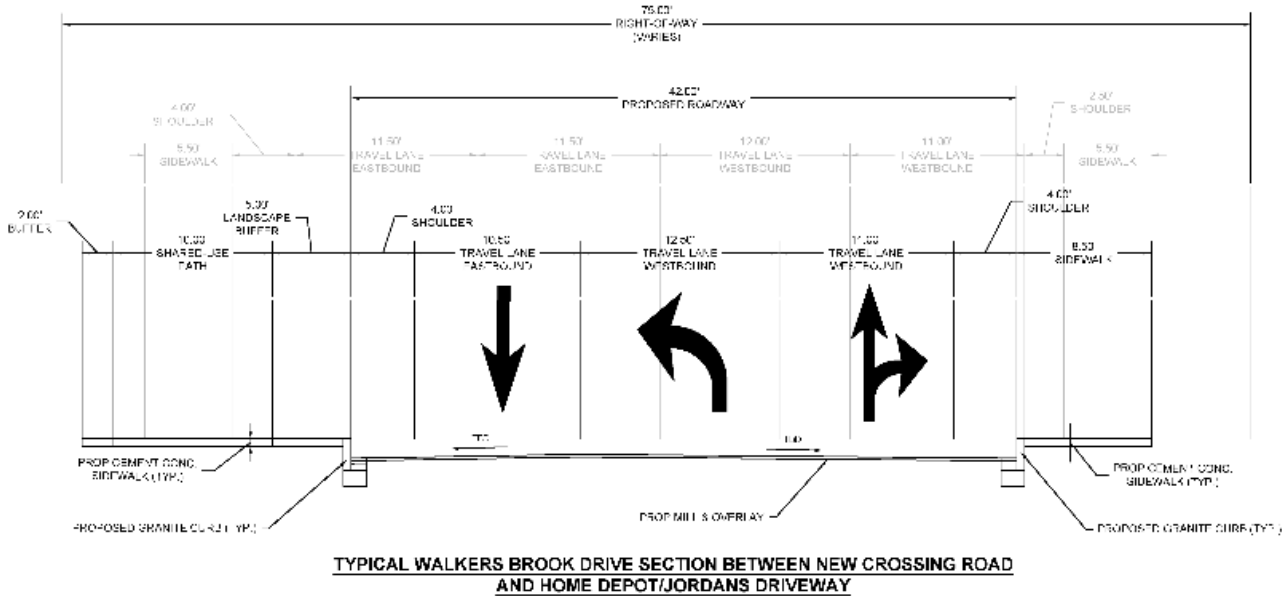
Alternative 2 (off-road shared use path) – Typical Section 1
